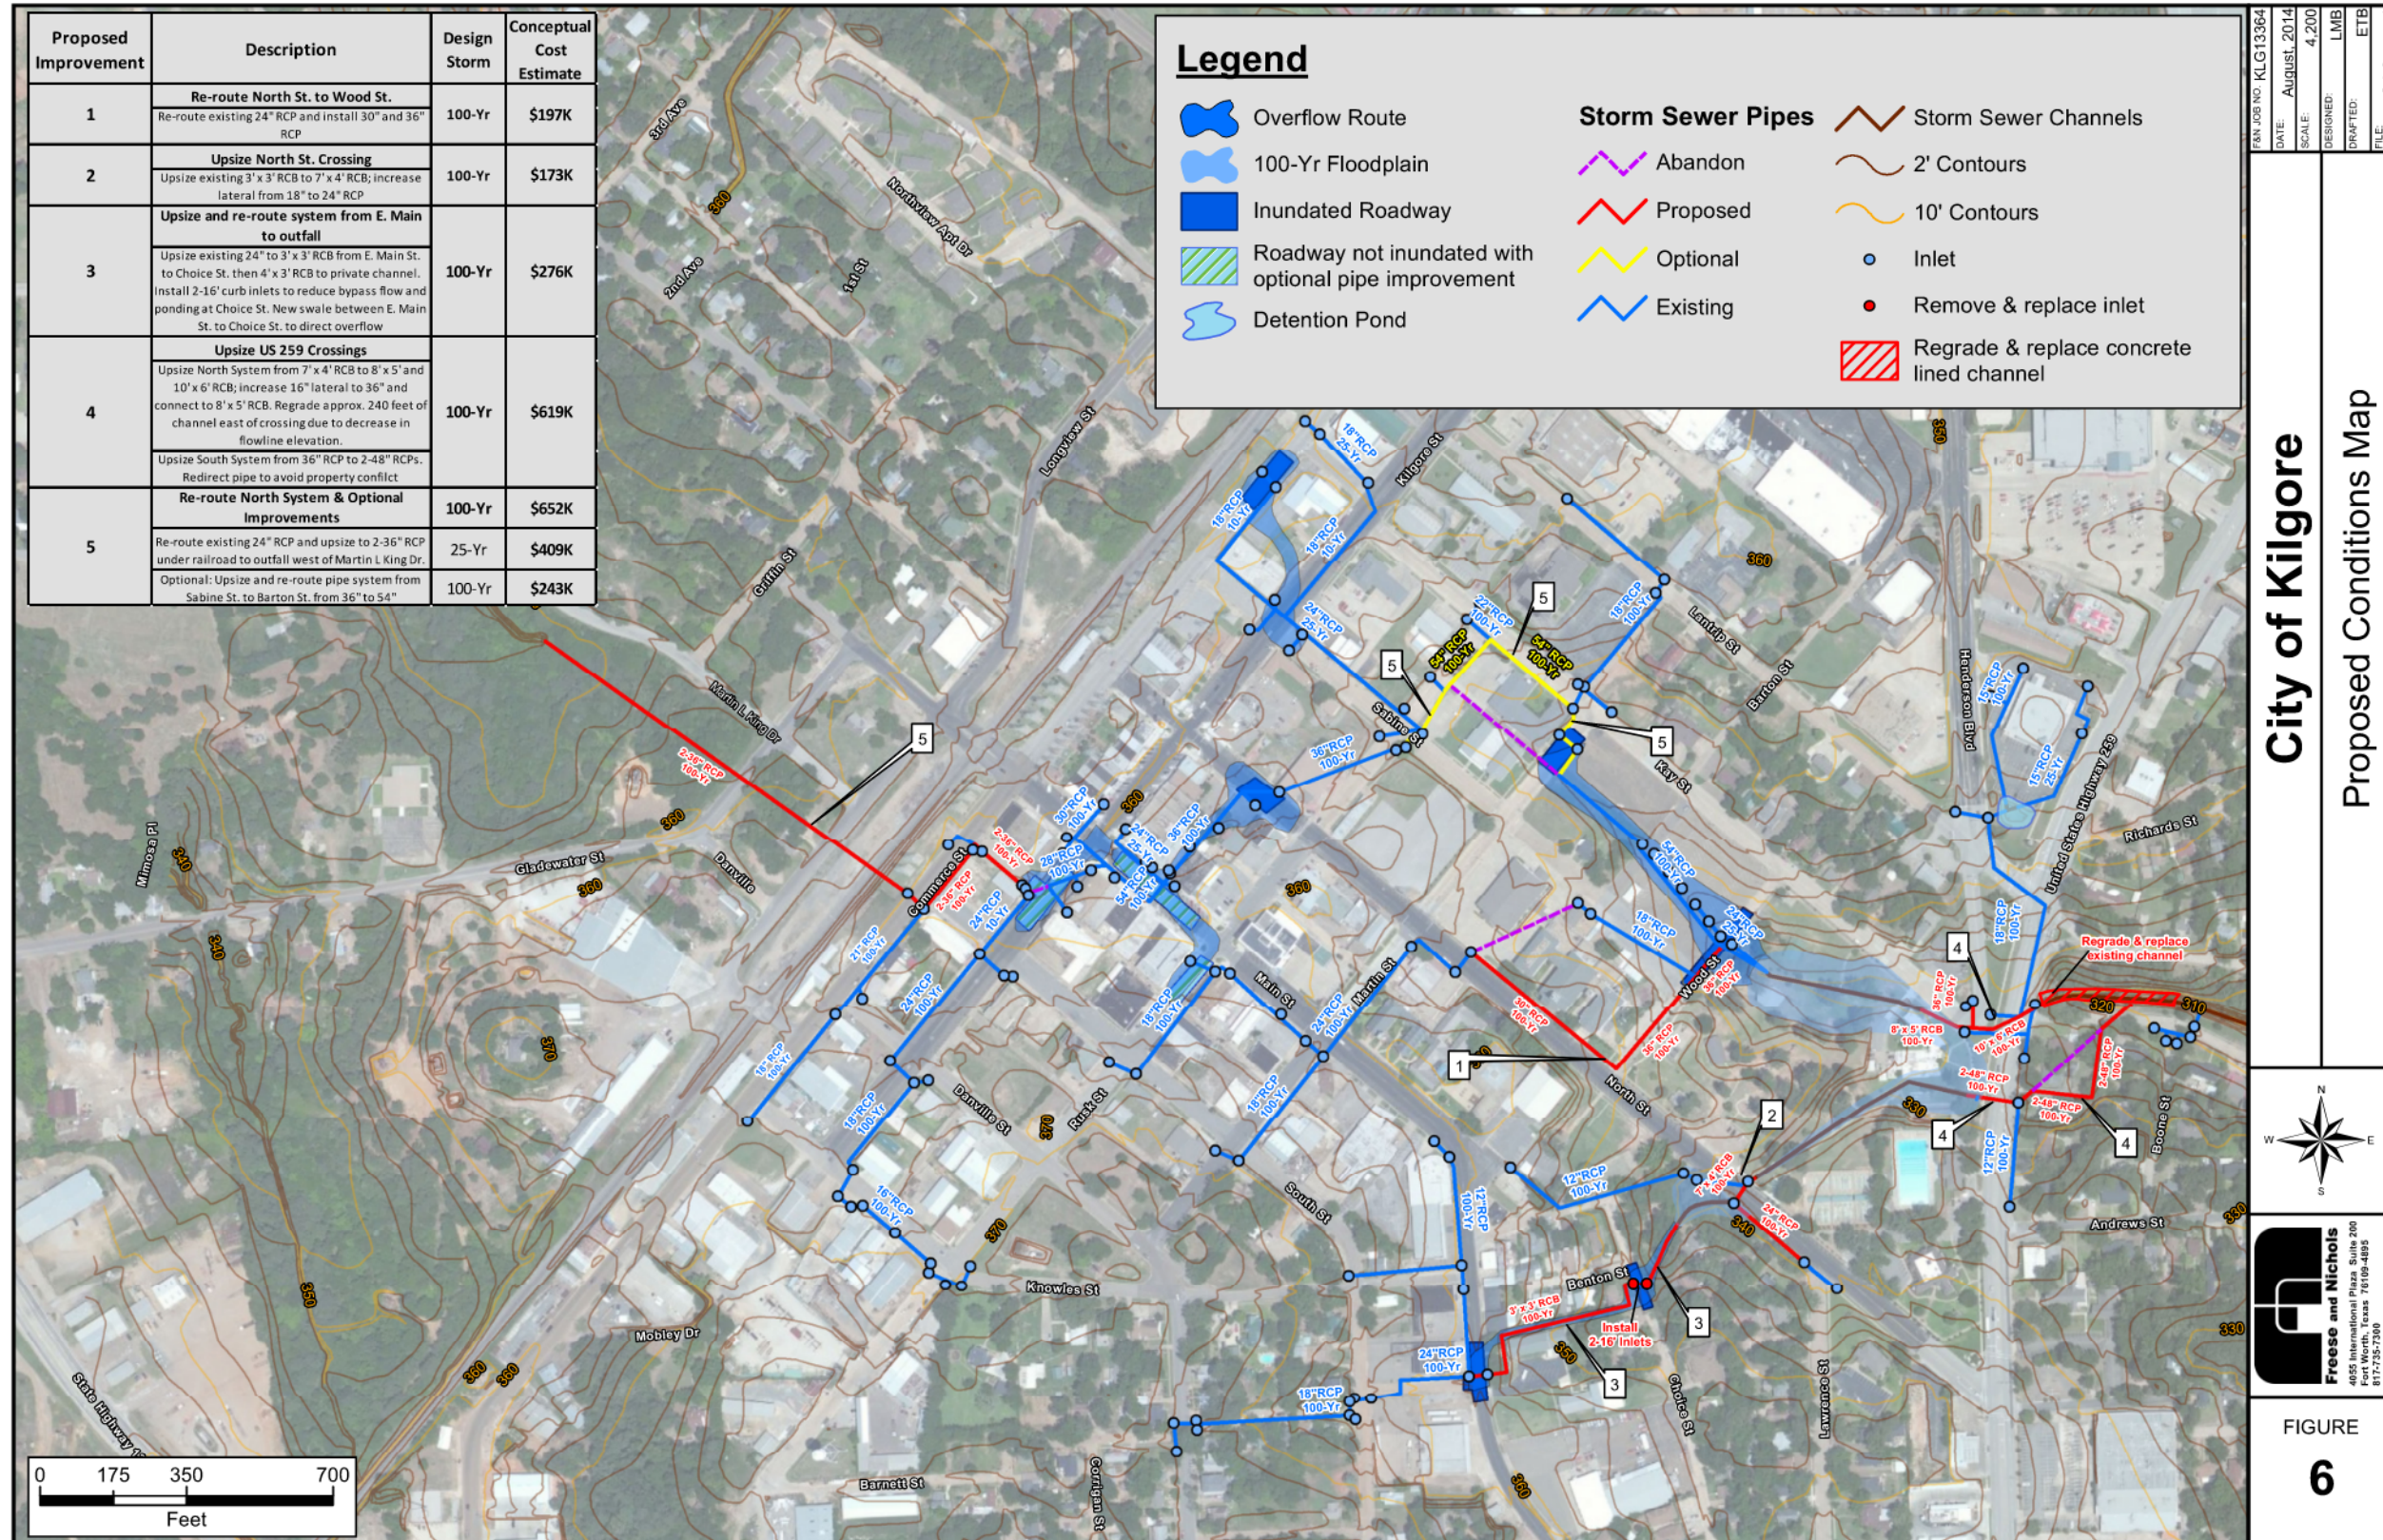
KILGORE DOWNTOWN STORM SEWER MASTER PLAN PROPOSED CONDITIONS
